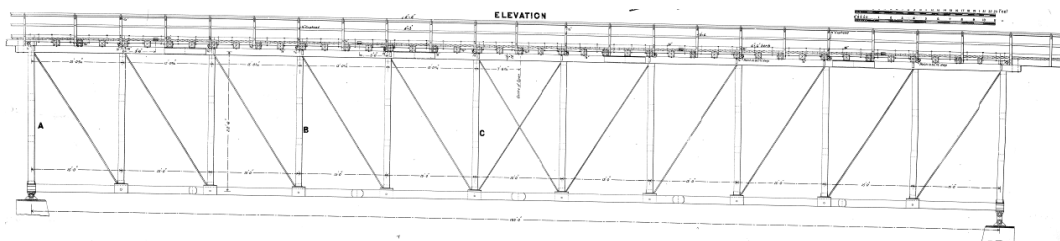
de Burgh Truss: de Burgh's Bridge 165 ft span over the Lane Cove River (truss under deck)
